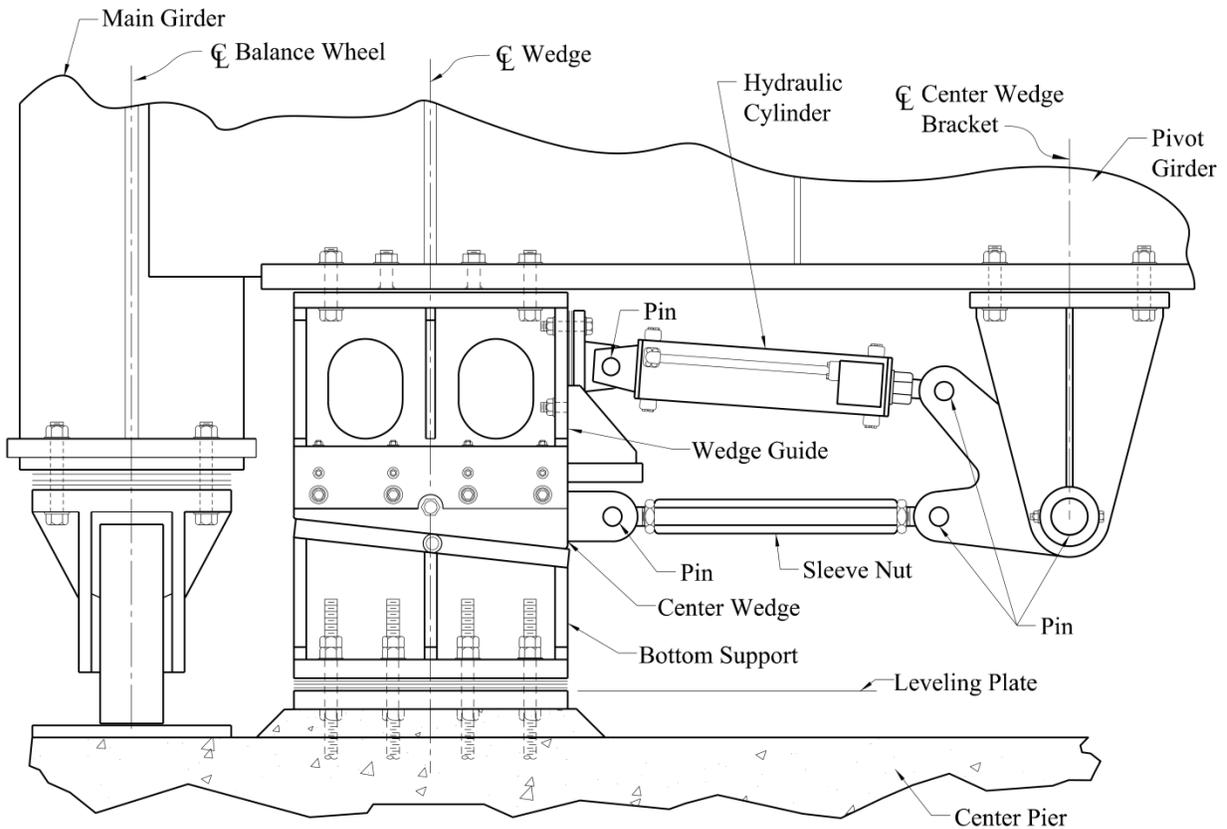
Typical Center Wedge Assembly
